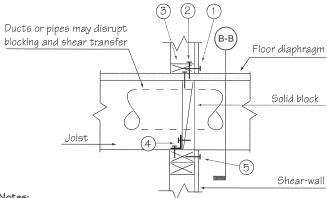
FIG. G ~ EXTERIOR WALL THROUGH-FLOOR SHEAR TRANSFER WITH SHEATHING SPLICED ON BLOCK OR RIM JOIST.
